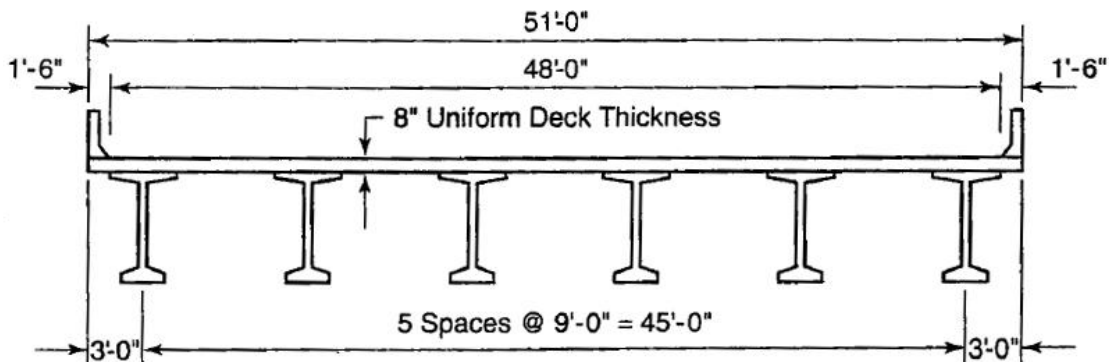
Bulb-tee Bridge Deck Cross Section in Example 12.1 (Ref. 12.11)
